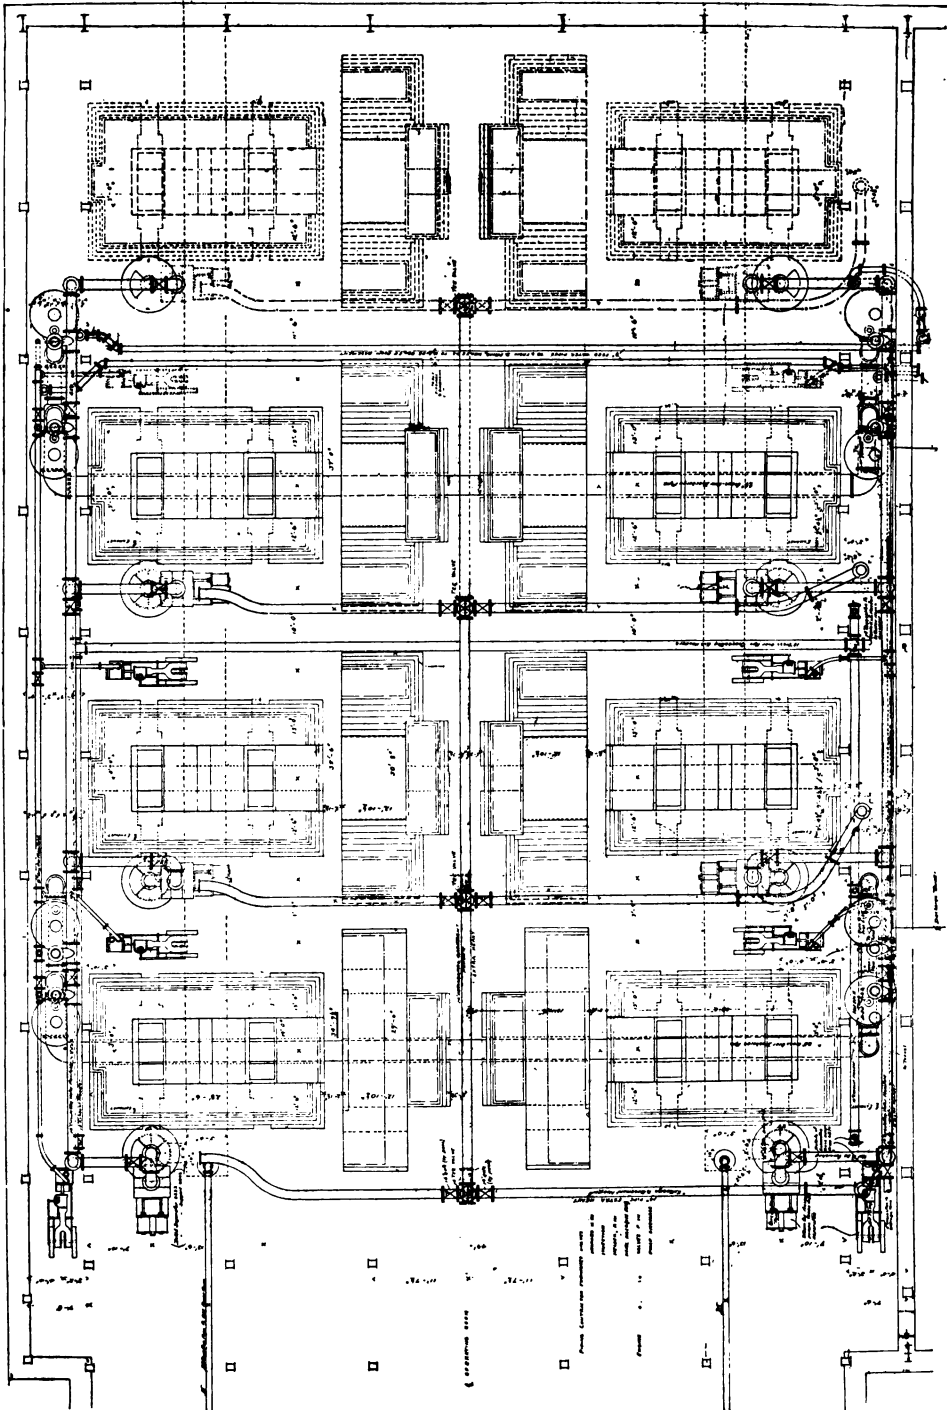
Plan of Feed Piping in Operating Room, Basement, Central Power Station, B. R. T.
